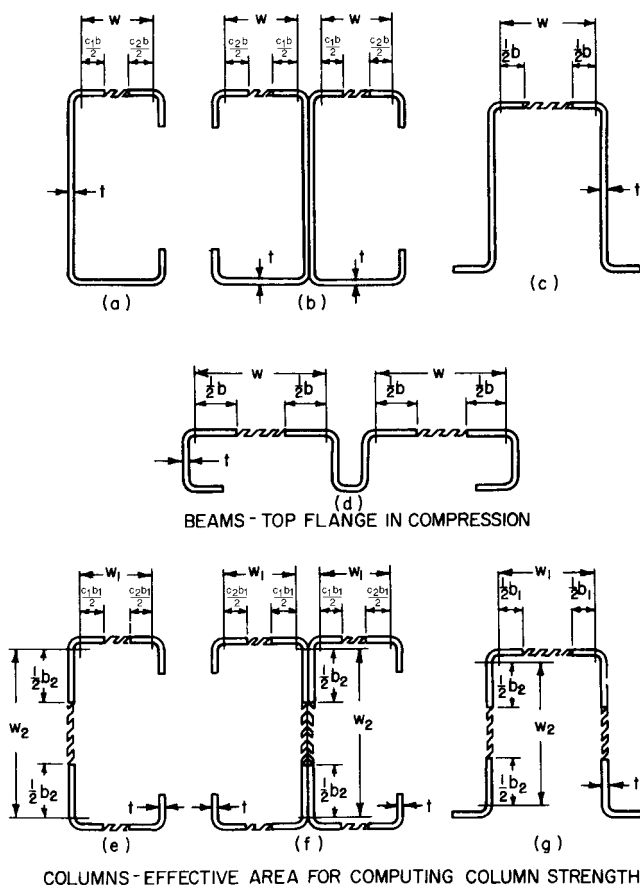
Effective width of stiffened compression elements with stiffening lips assumed to be fully effective.
